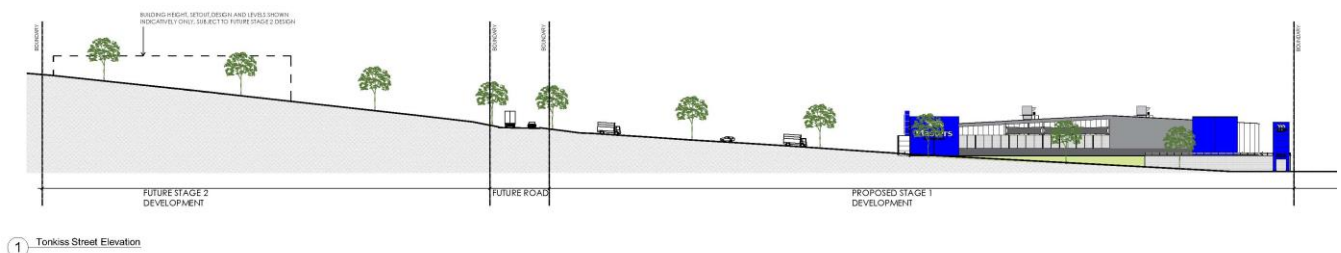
Street view of Stage 1- Masters Homemaker Improvement Centre and future Stage 2.
